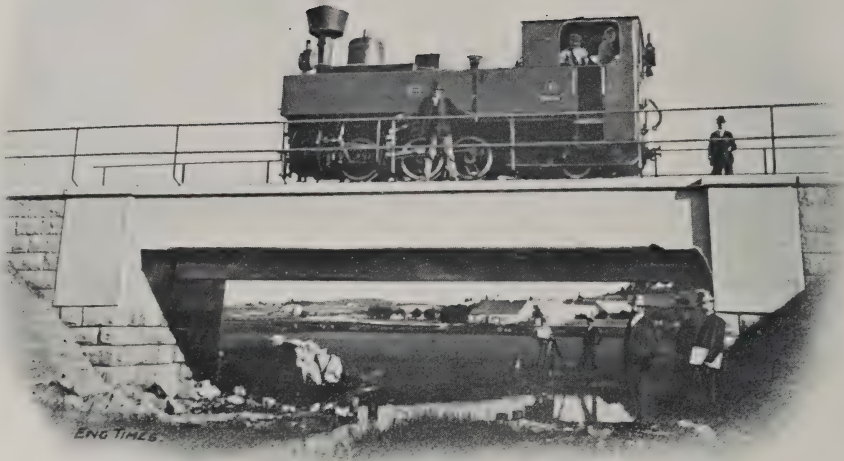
ARMoured CONCRETE GIRDER BRIDGE OF 40 FT. SPAN.
